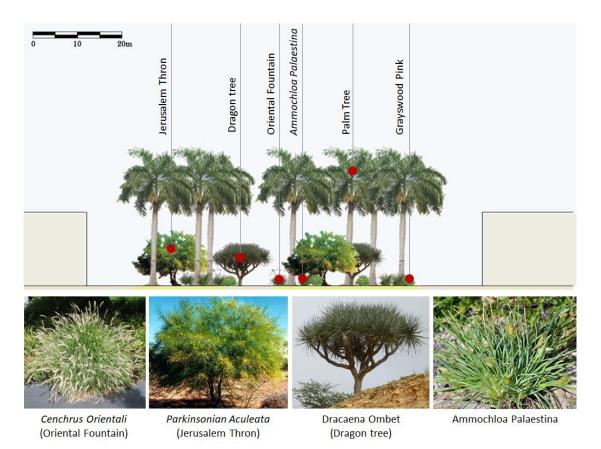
Section E-E showing the alternative's plantations. Source: Authors
